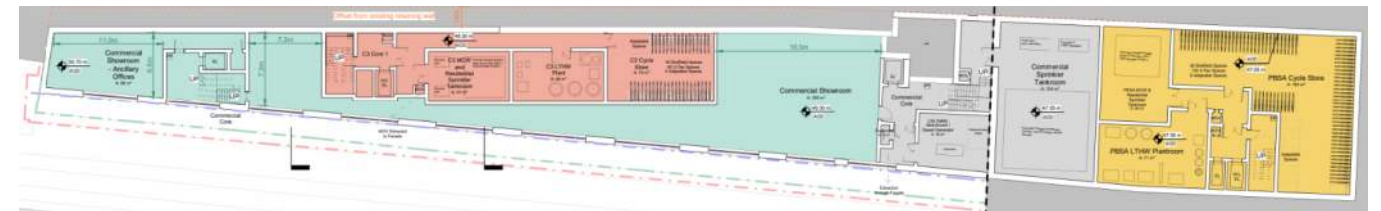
Proposed basement and platform level floor plan (HTA Design)
